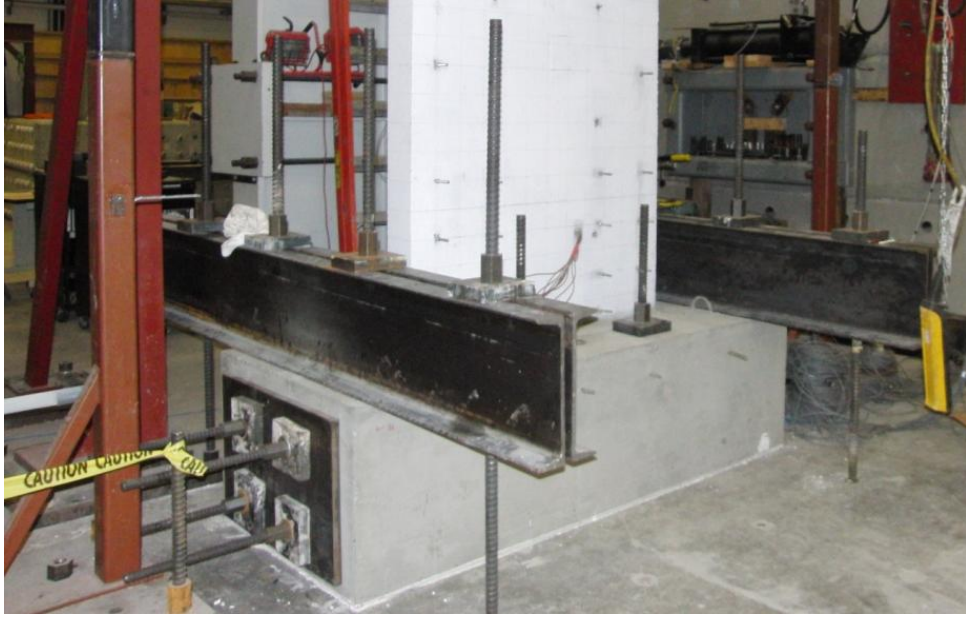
Photograph of wall specimen anchorage and post-tensioning at side faces of the foundation block
